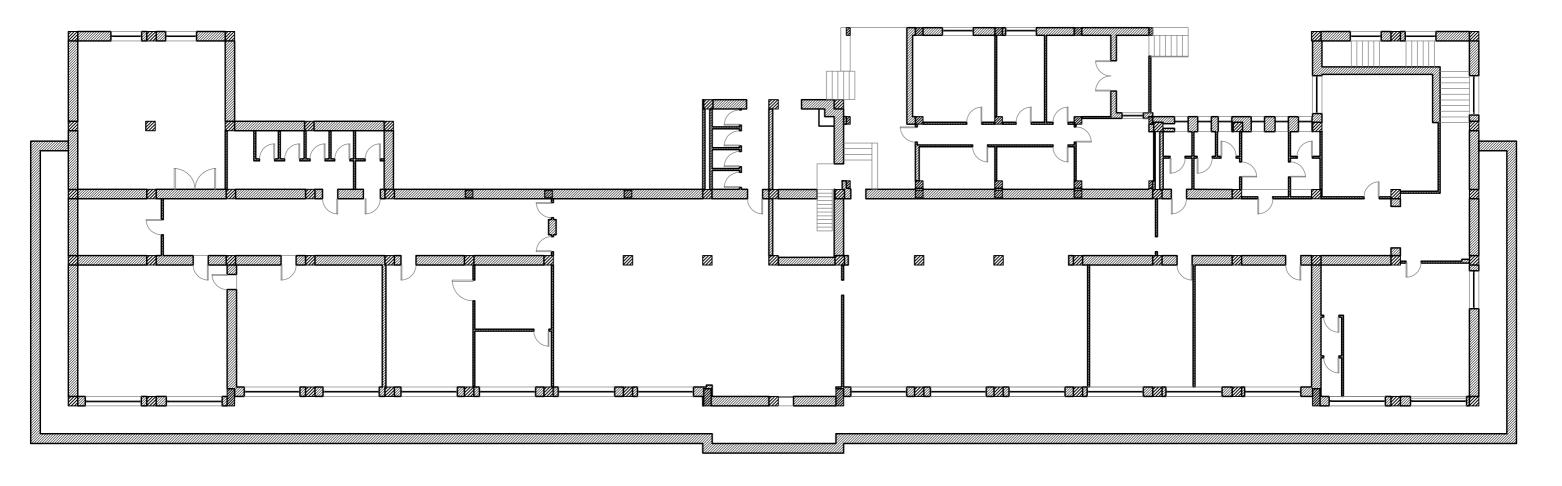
Basement Architectural Floor Plan Quote + 3,60 m | Scale 1:200
